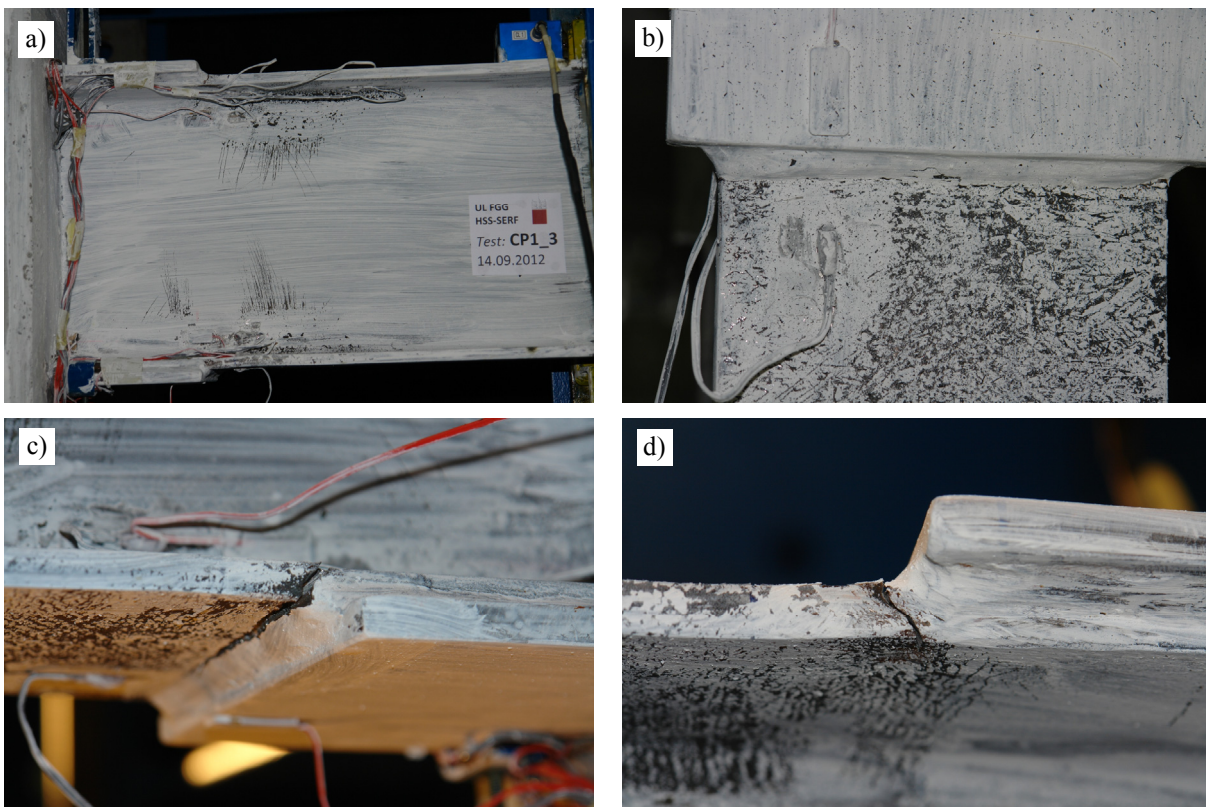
Specimen CP1.3 after the test: a) local strained area of the beam just after the stiffened section, b) top beam flange, c) crack on bottom beam flange, d) damaged edge of top beam flange
